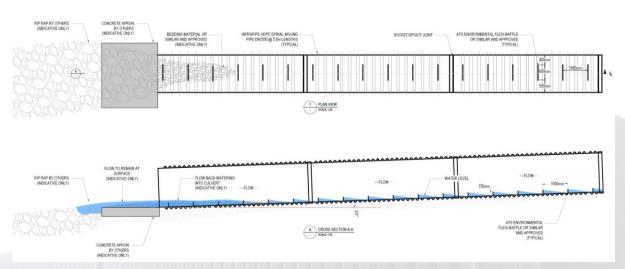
A typical best practice fish passage design showing the installation of rigid baffles and outlet mitigations
